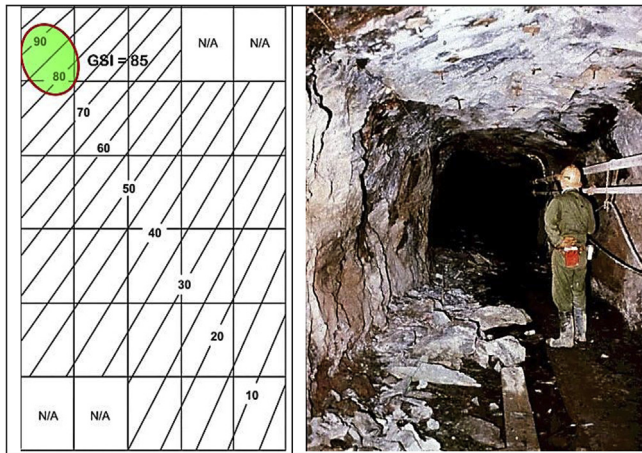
Spalling in the sidewalls of a mine tunnel in intact hard rock subjected to anisotropic horizontal stresses. GSI is not applicable in the analysis of these stress-induced spalls but it can be used for other applications.
